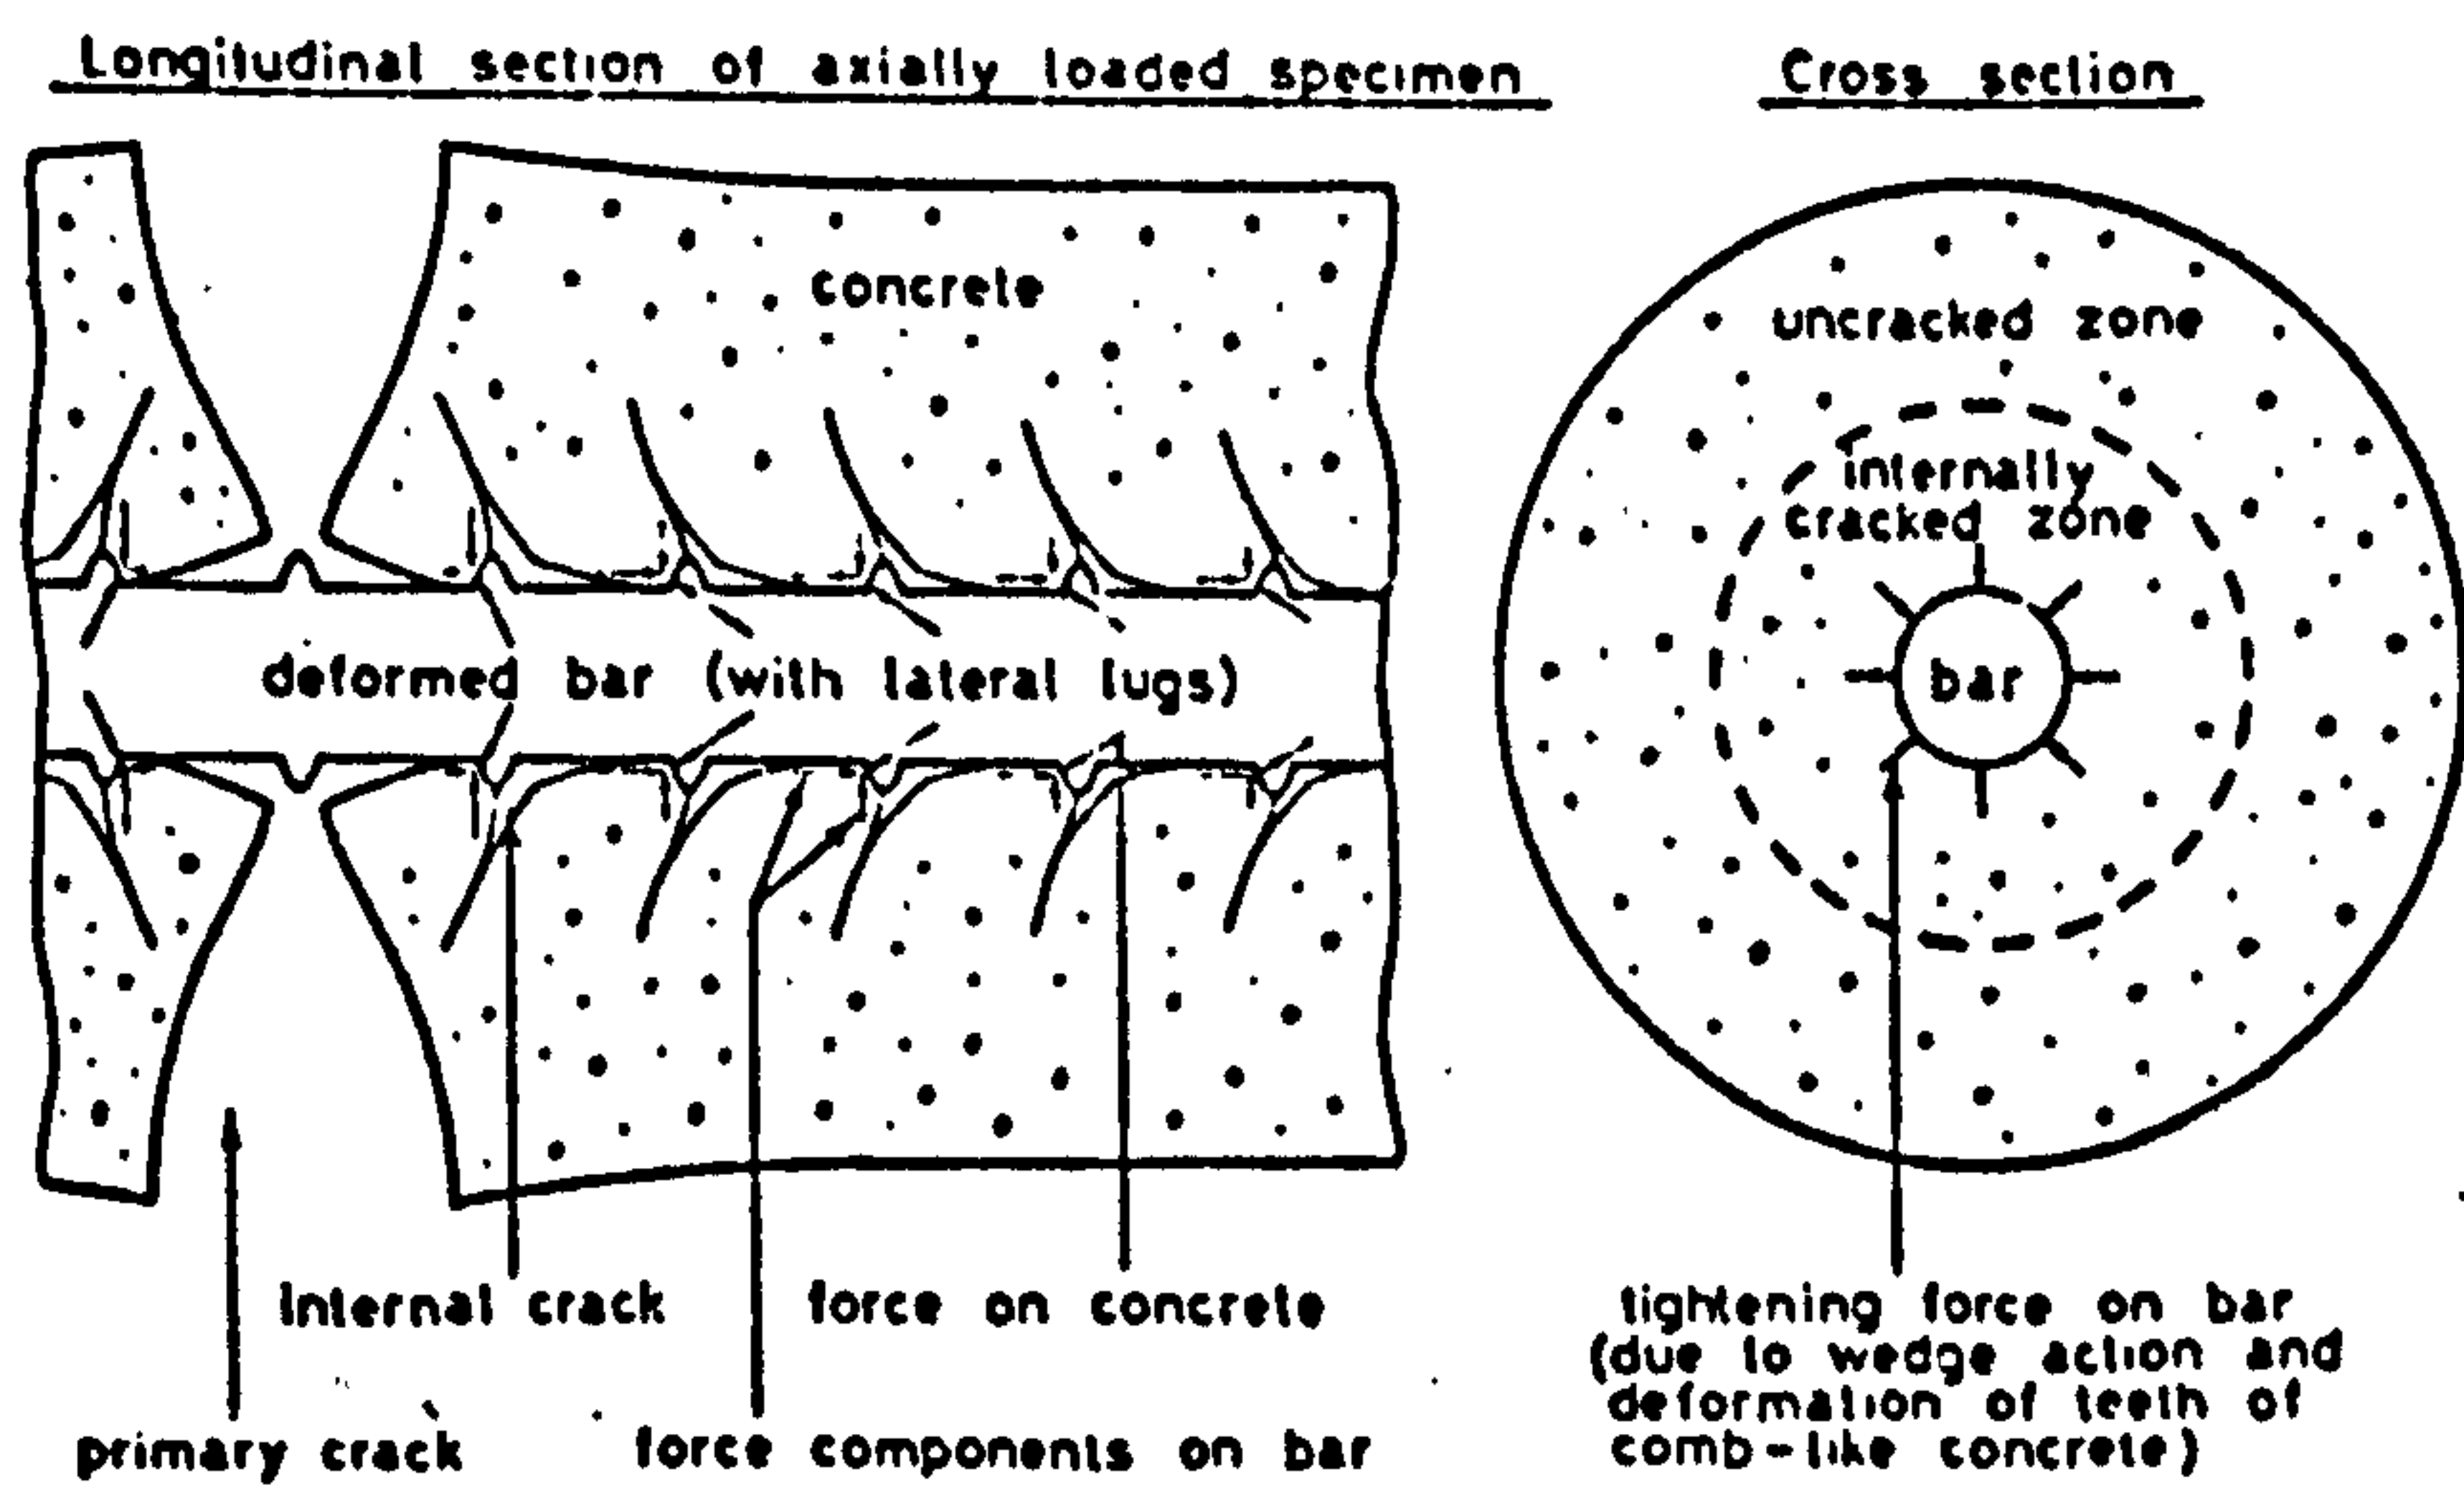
Deformation of concrete around steel reinforcing bar after formation of internal cracks (schematic diagram) by Goto<sup>(38)</sup>
